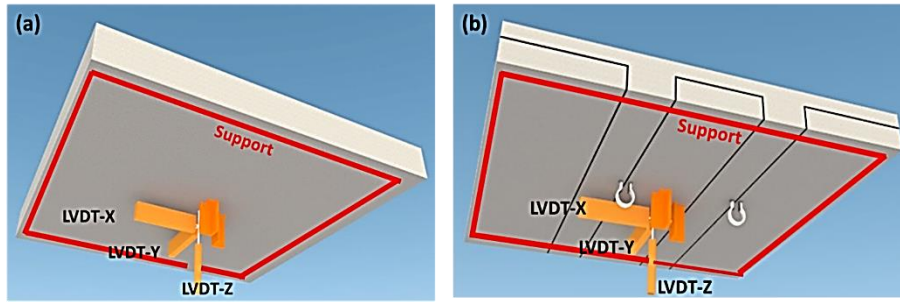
Configuration of the LVDTs and Support on the (a) Monolithic slab 20, and (b) RRC-HCPS Slab
